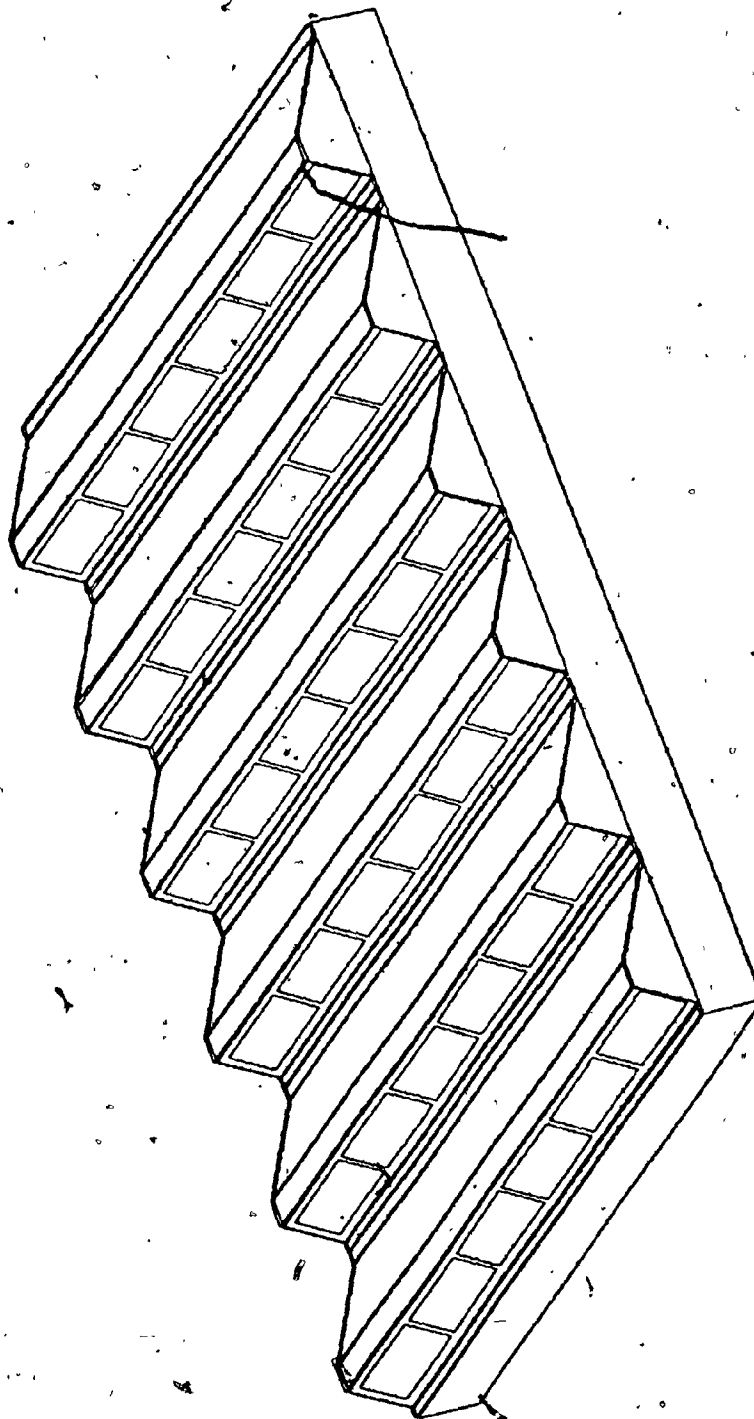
TYPICAL VIEW OF ROOFING SYSTEM WITH SIX ARRAYS OF GLAZINGS
